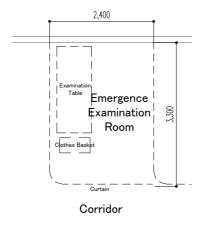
Floor plan of the Treatment Room in the Emergency Department
